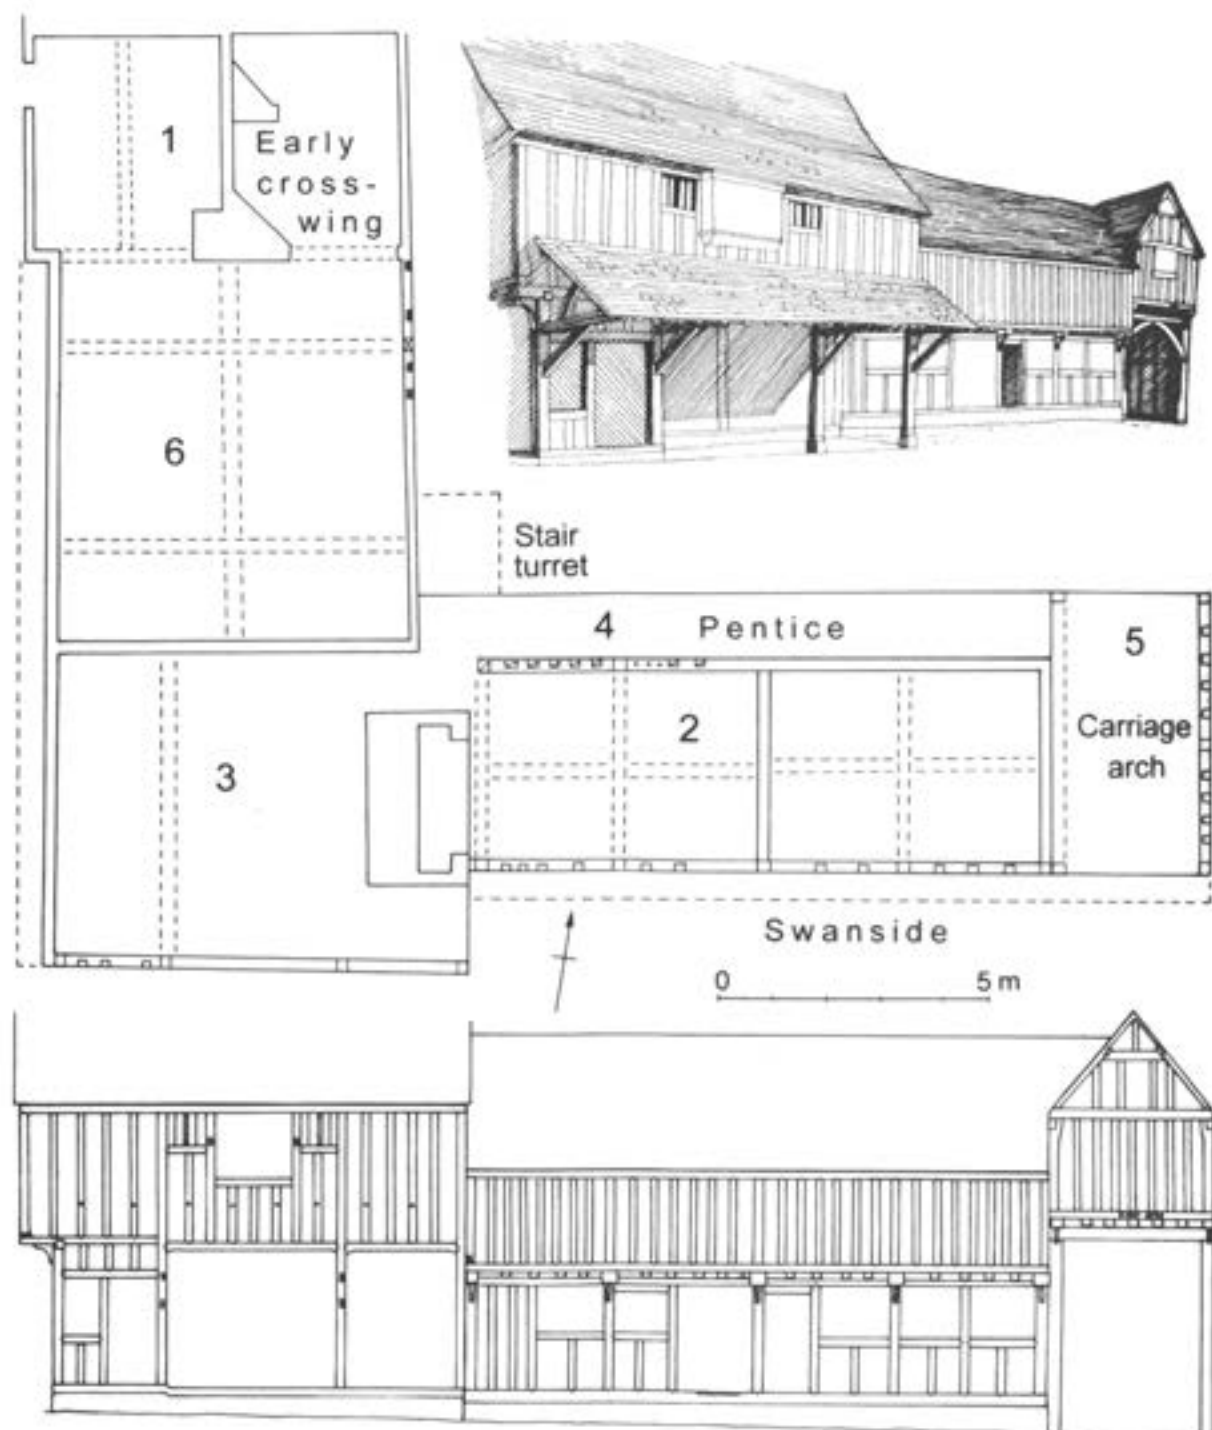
Braintree, The Swan, plan showing the development of the building, reconstruction of the elevation to Swanside, and reconstruction of its original appearance by D.F. Stenning. (Bank Street is on the west side of the building).
